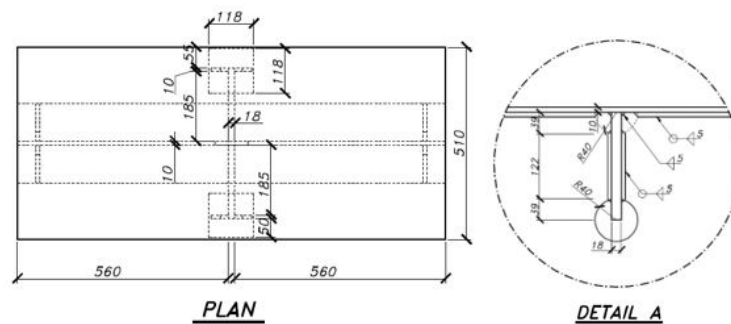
Left: Plan view of the test specimen and Right: Detail view of the investigated connection [10] [9]
